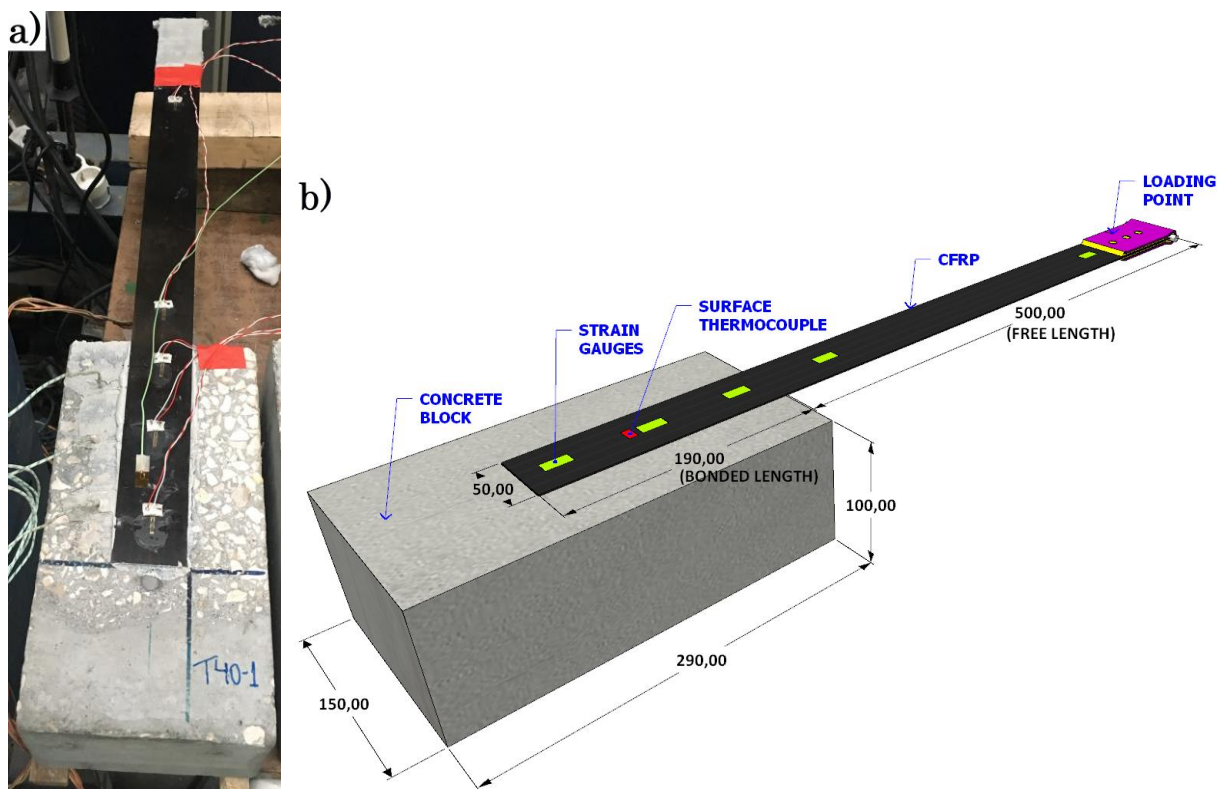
Geometry and details of the specimens: (a) general and (b) schematic view (dimensions in mm)
